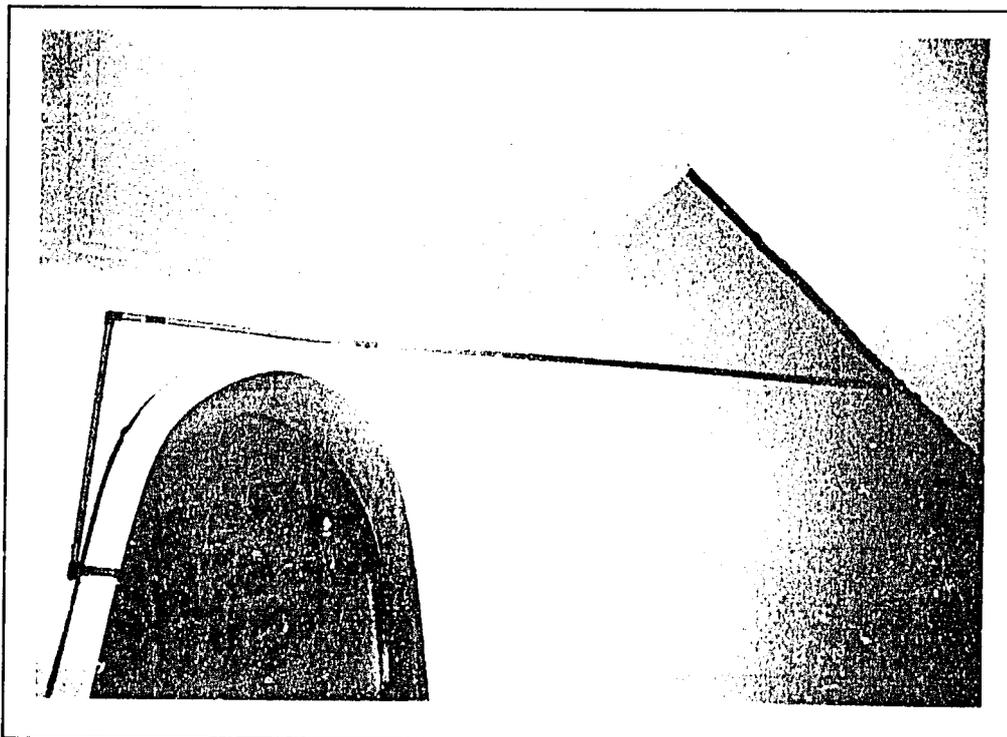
Quetta AID/REP Office Facility. Hallway to second floor. Cable to be routed with conduit.
